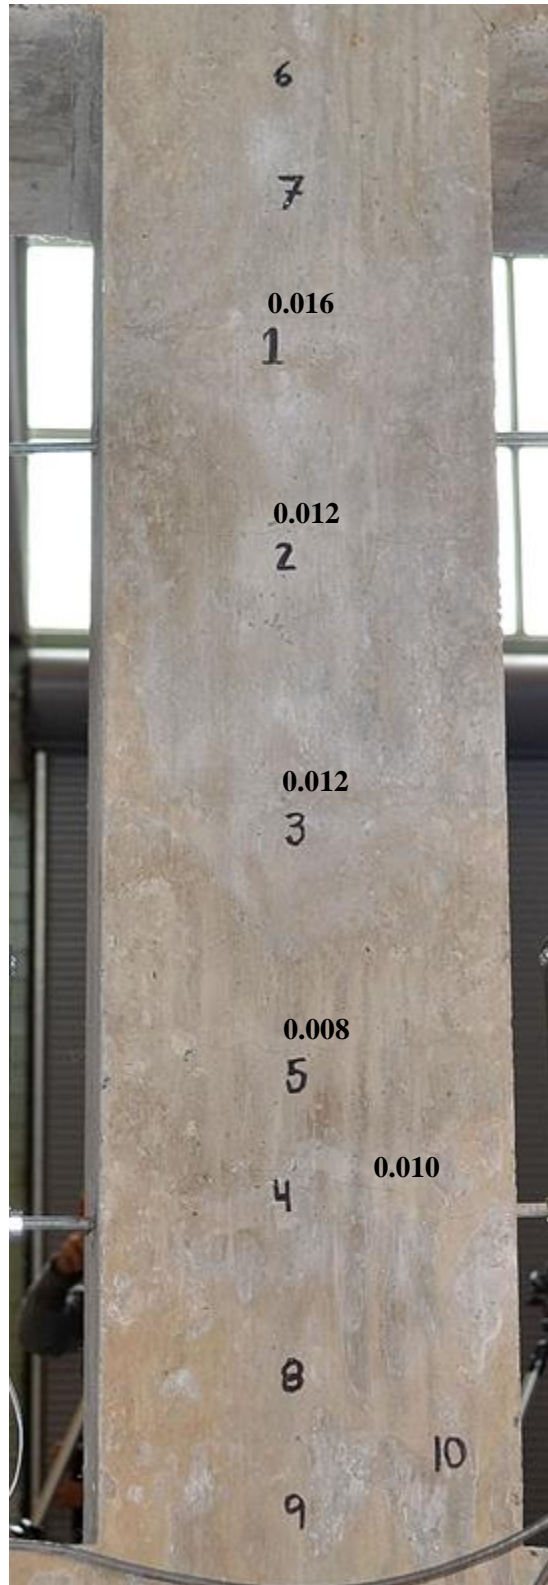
Cracks on east face of TS01 at Load Step 15
